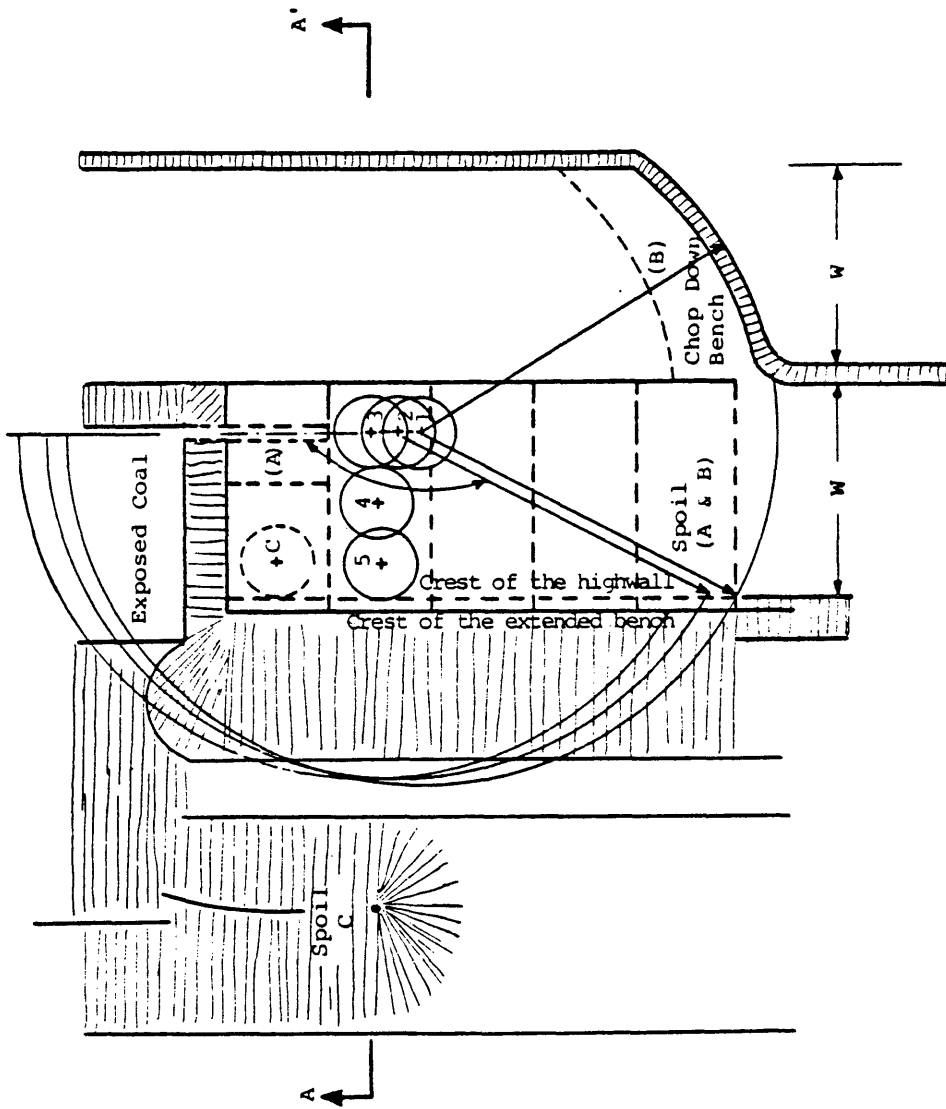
Plan View of the Dragline Locations For Extended Bench With Chop Down Method.
